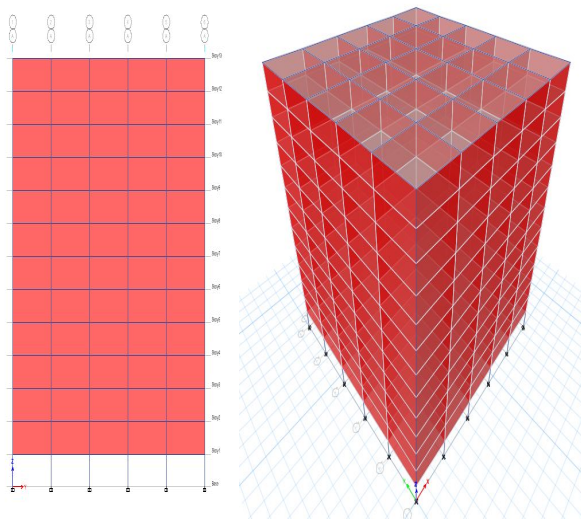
Model No. 1: Multistorey building with Soft floor at ground floor
